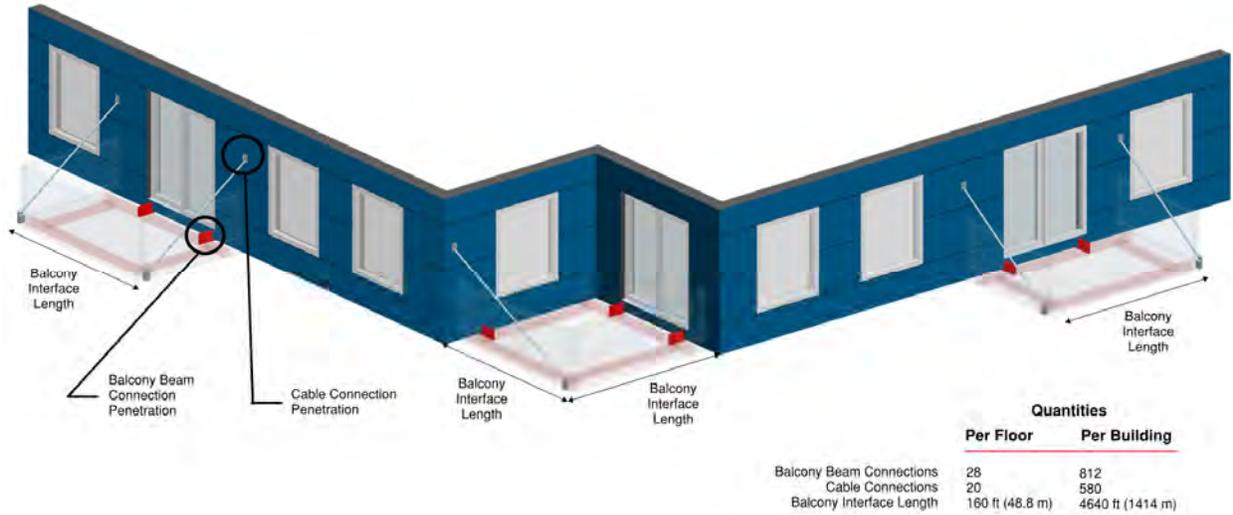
Balcony Layout and Quantities for a Floor for Example Thermal Transmittance Calculation (25% of floor shown)
